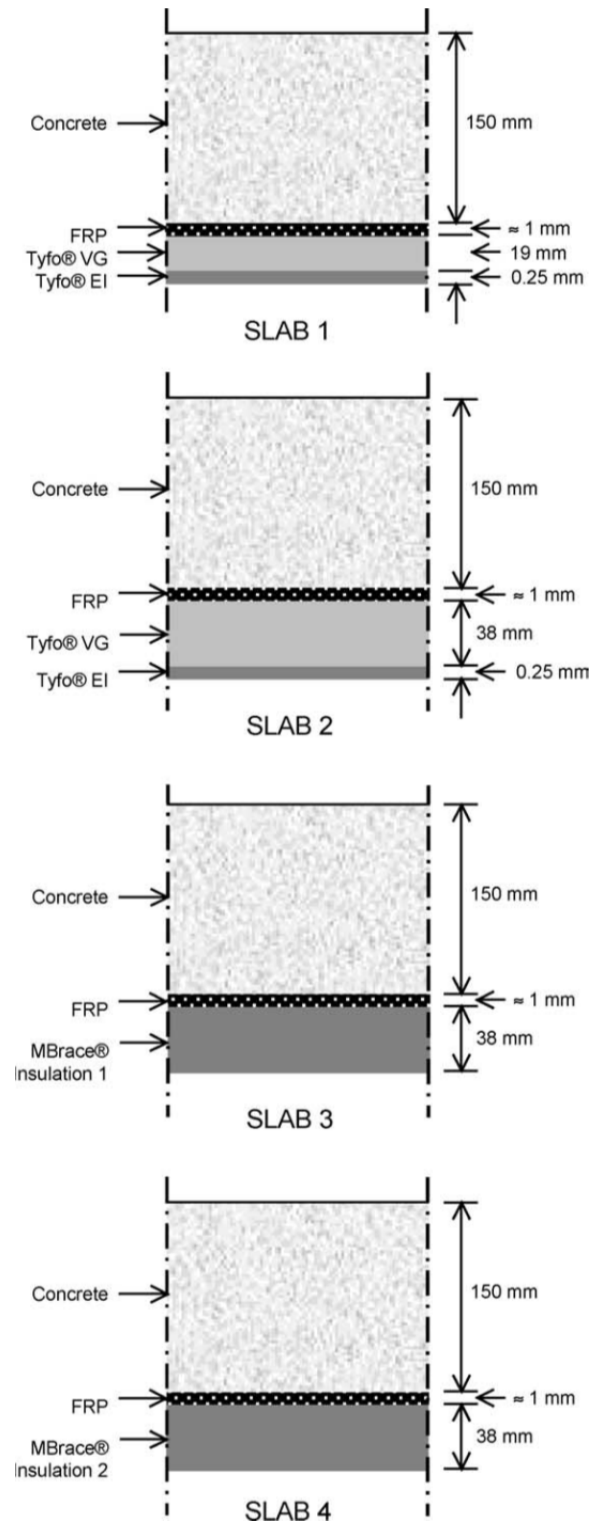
Through-thickness details of the four insulated FRP-strengthened reinforced concrete slab specimens tested, (Brea Williams, et al., 2006)
